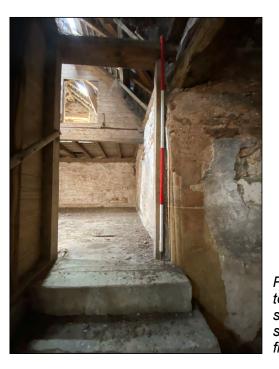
View from the north of top of stairs at first-floor level, showing the surviving, decorated south jamb of former first-floor fireplace.
